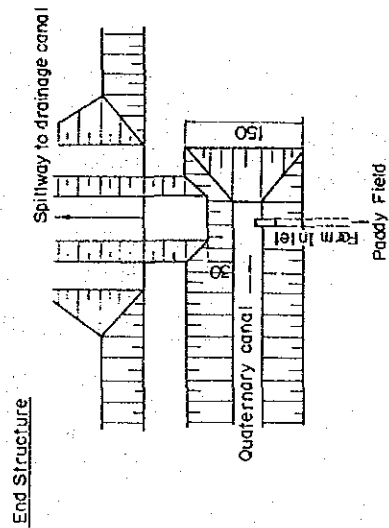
Typical Layout of On-farm Facilities (3/4)
